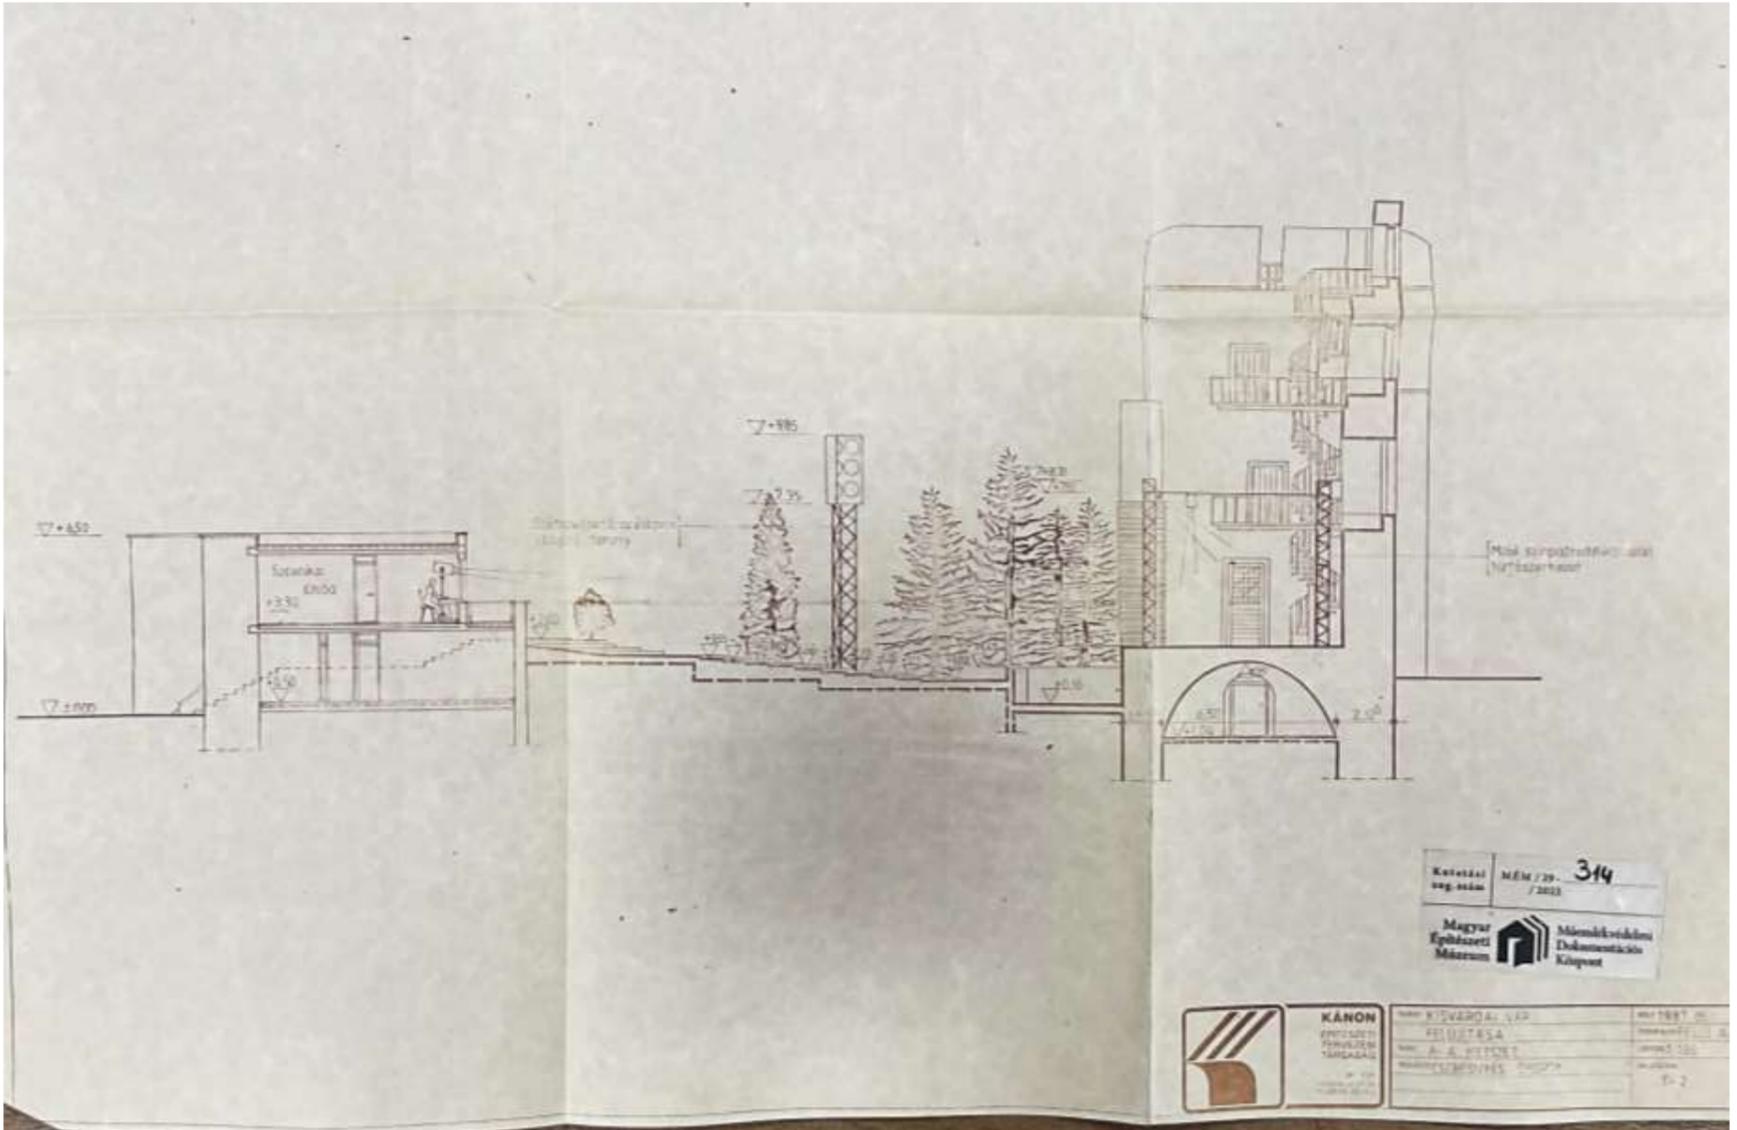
Plans made by Kánon Ltd. in 1986. (MÉM MDK Architecture Plan Collection, 38748)
